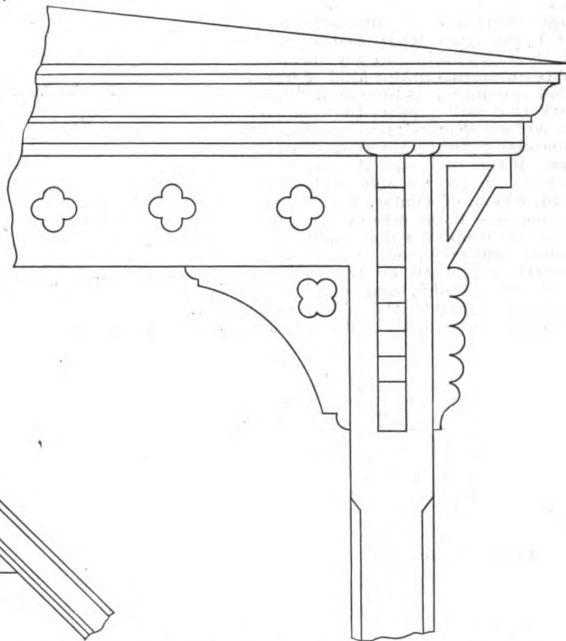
Detail of Porch Finish.—Scale, 1 Inch to the Foot.
